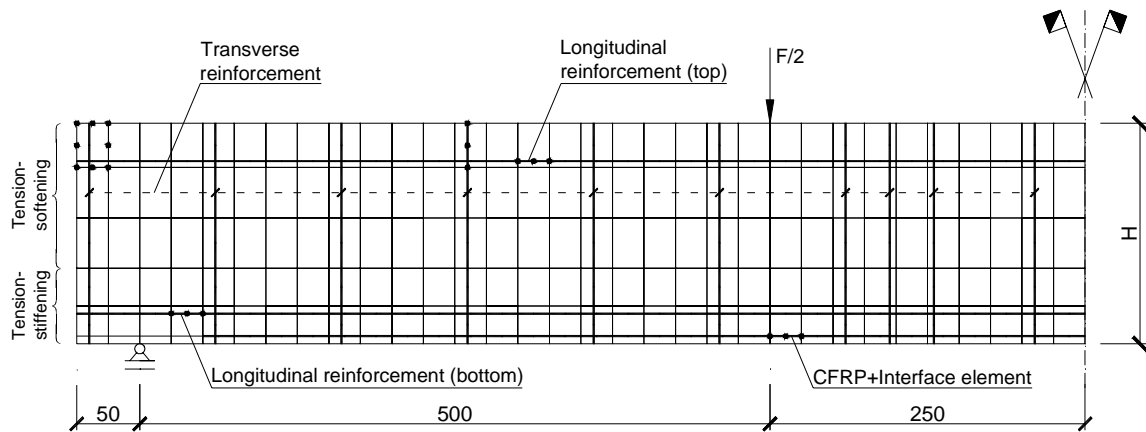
Geometry, mesh, loading and support conditions of reinforced concrete beams strengthened with CFRP laminate strips. Bond-slip at the CFRP-concrete interface is modeled. Note: all dimensions are in millimeters.
